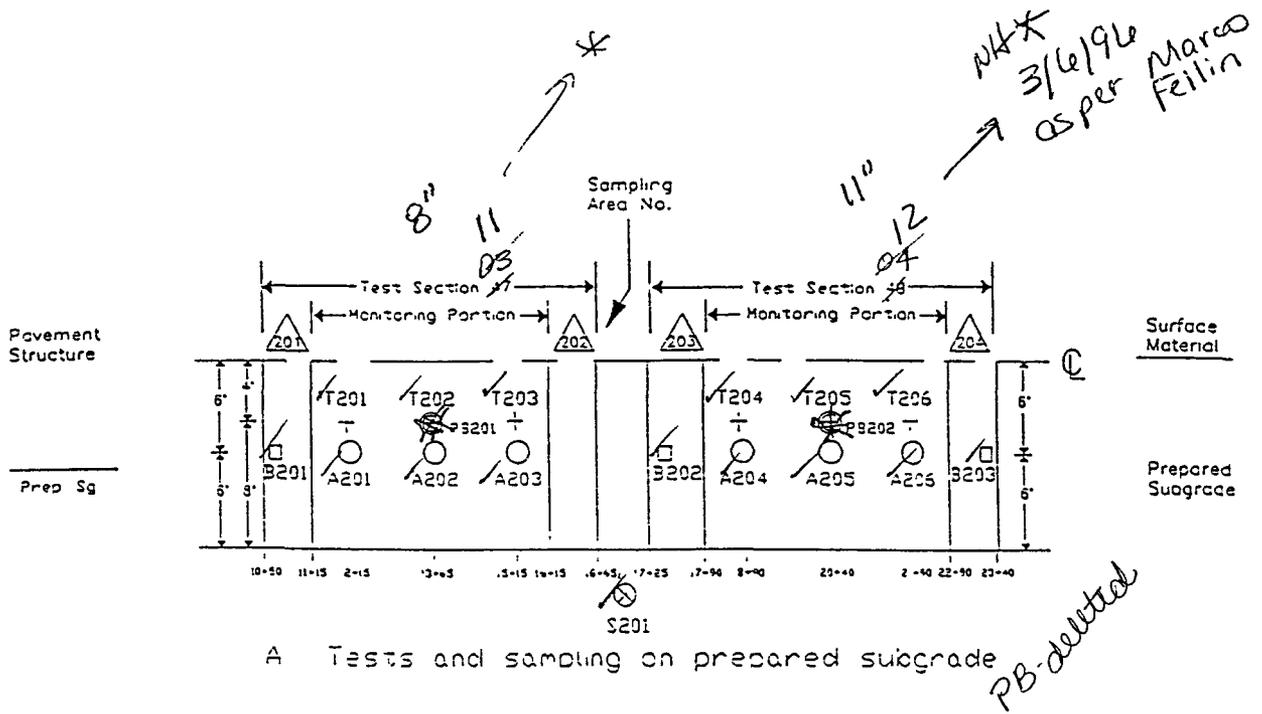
Sampling and test plans for SPS-8 test sections, Chestnut Street, I-76 project, Colorado.
